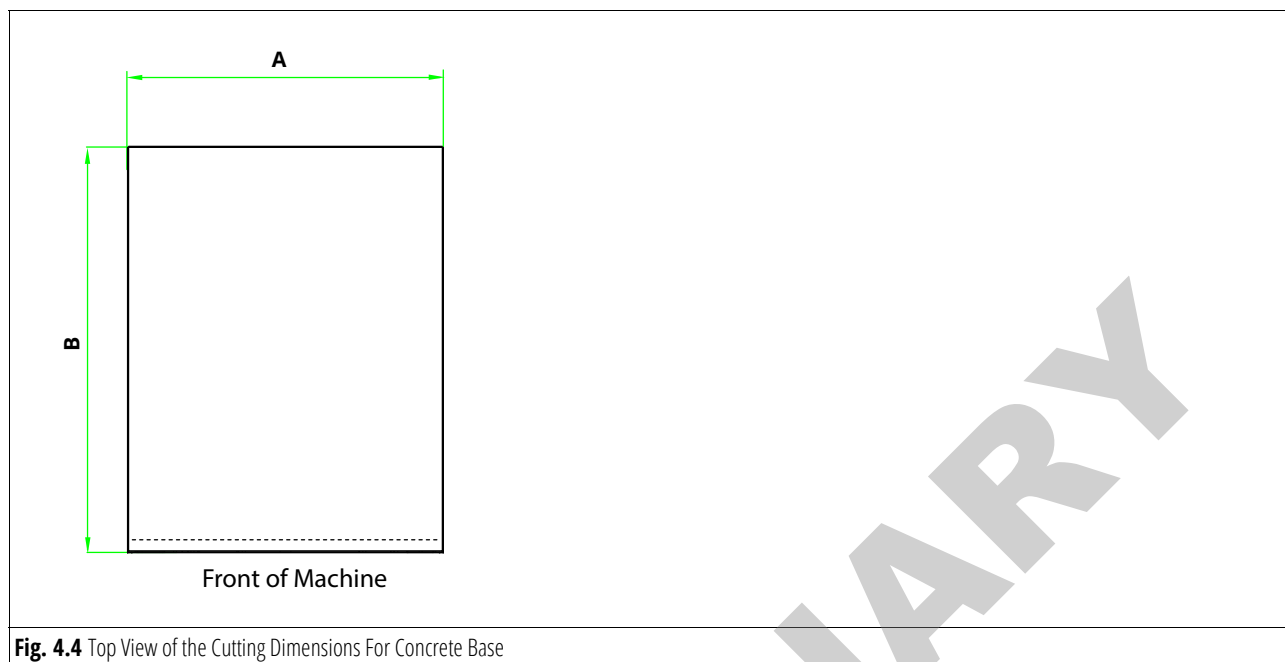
Top View of the Cutting Dimensions For Concrete Base
